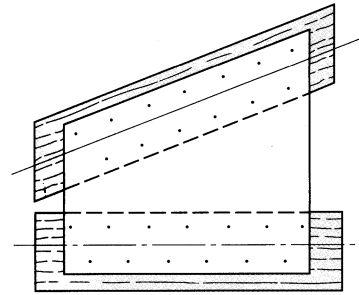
Nailing of plywood gusset plates or fitch plates to minimise strain on fastenings
